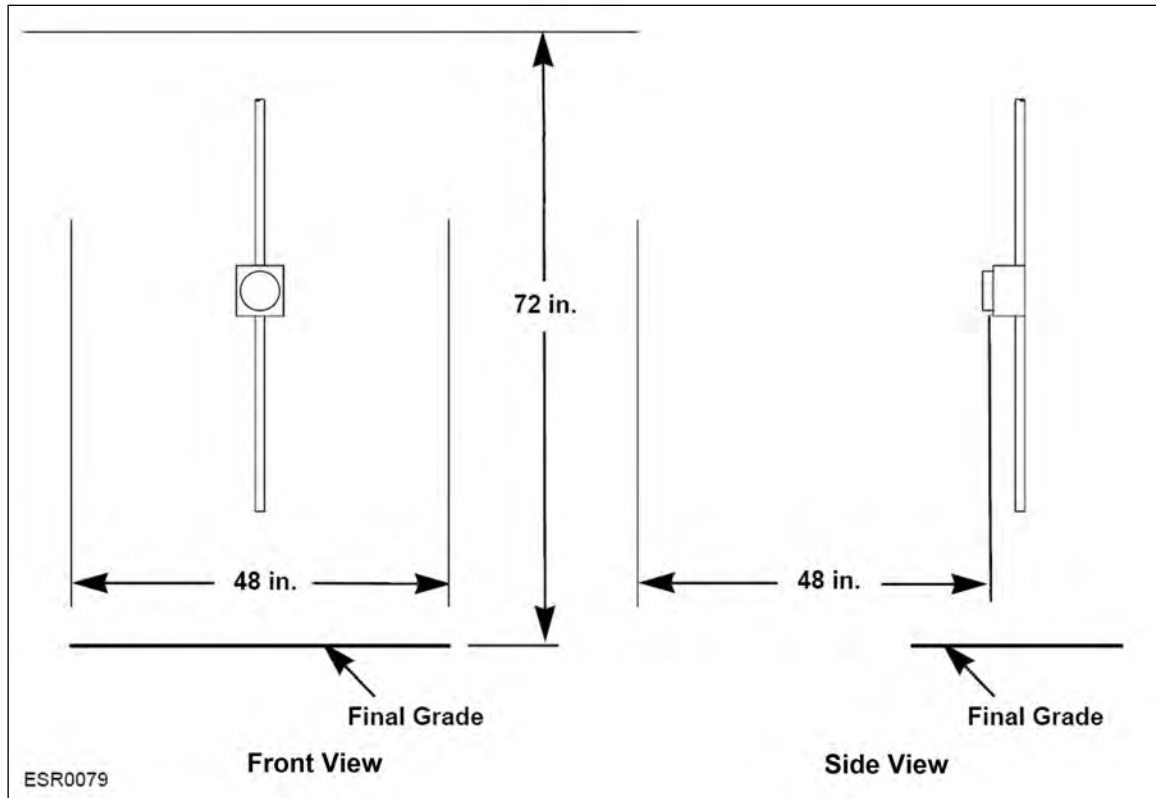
Minimum Unobstructed Workspace Around Metering Equipment
